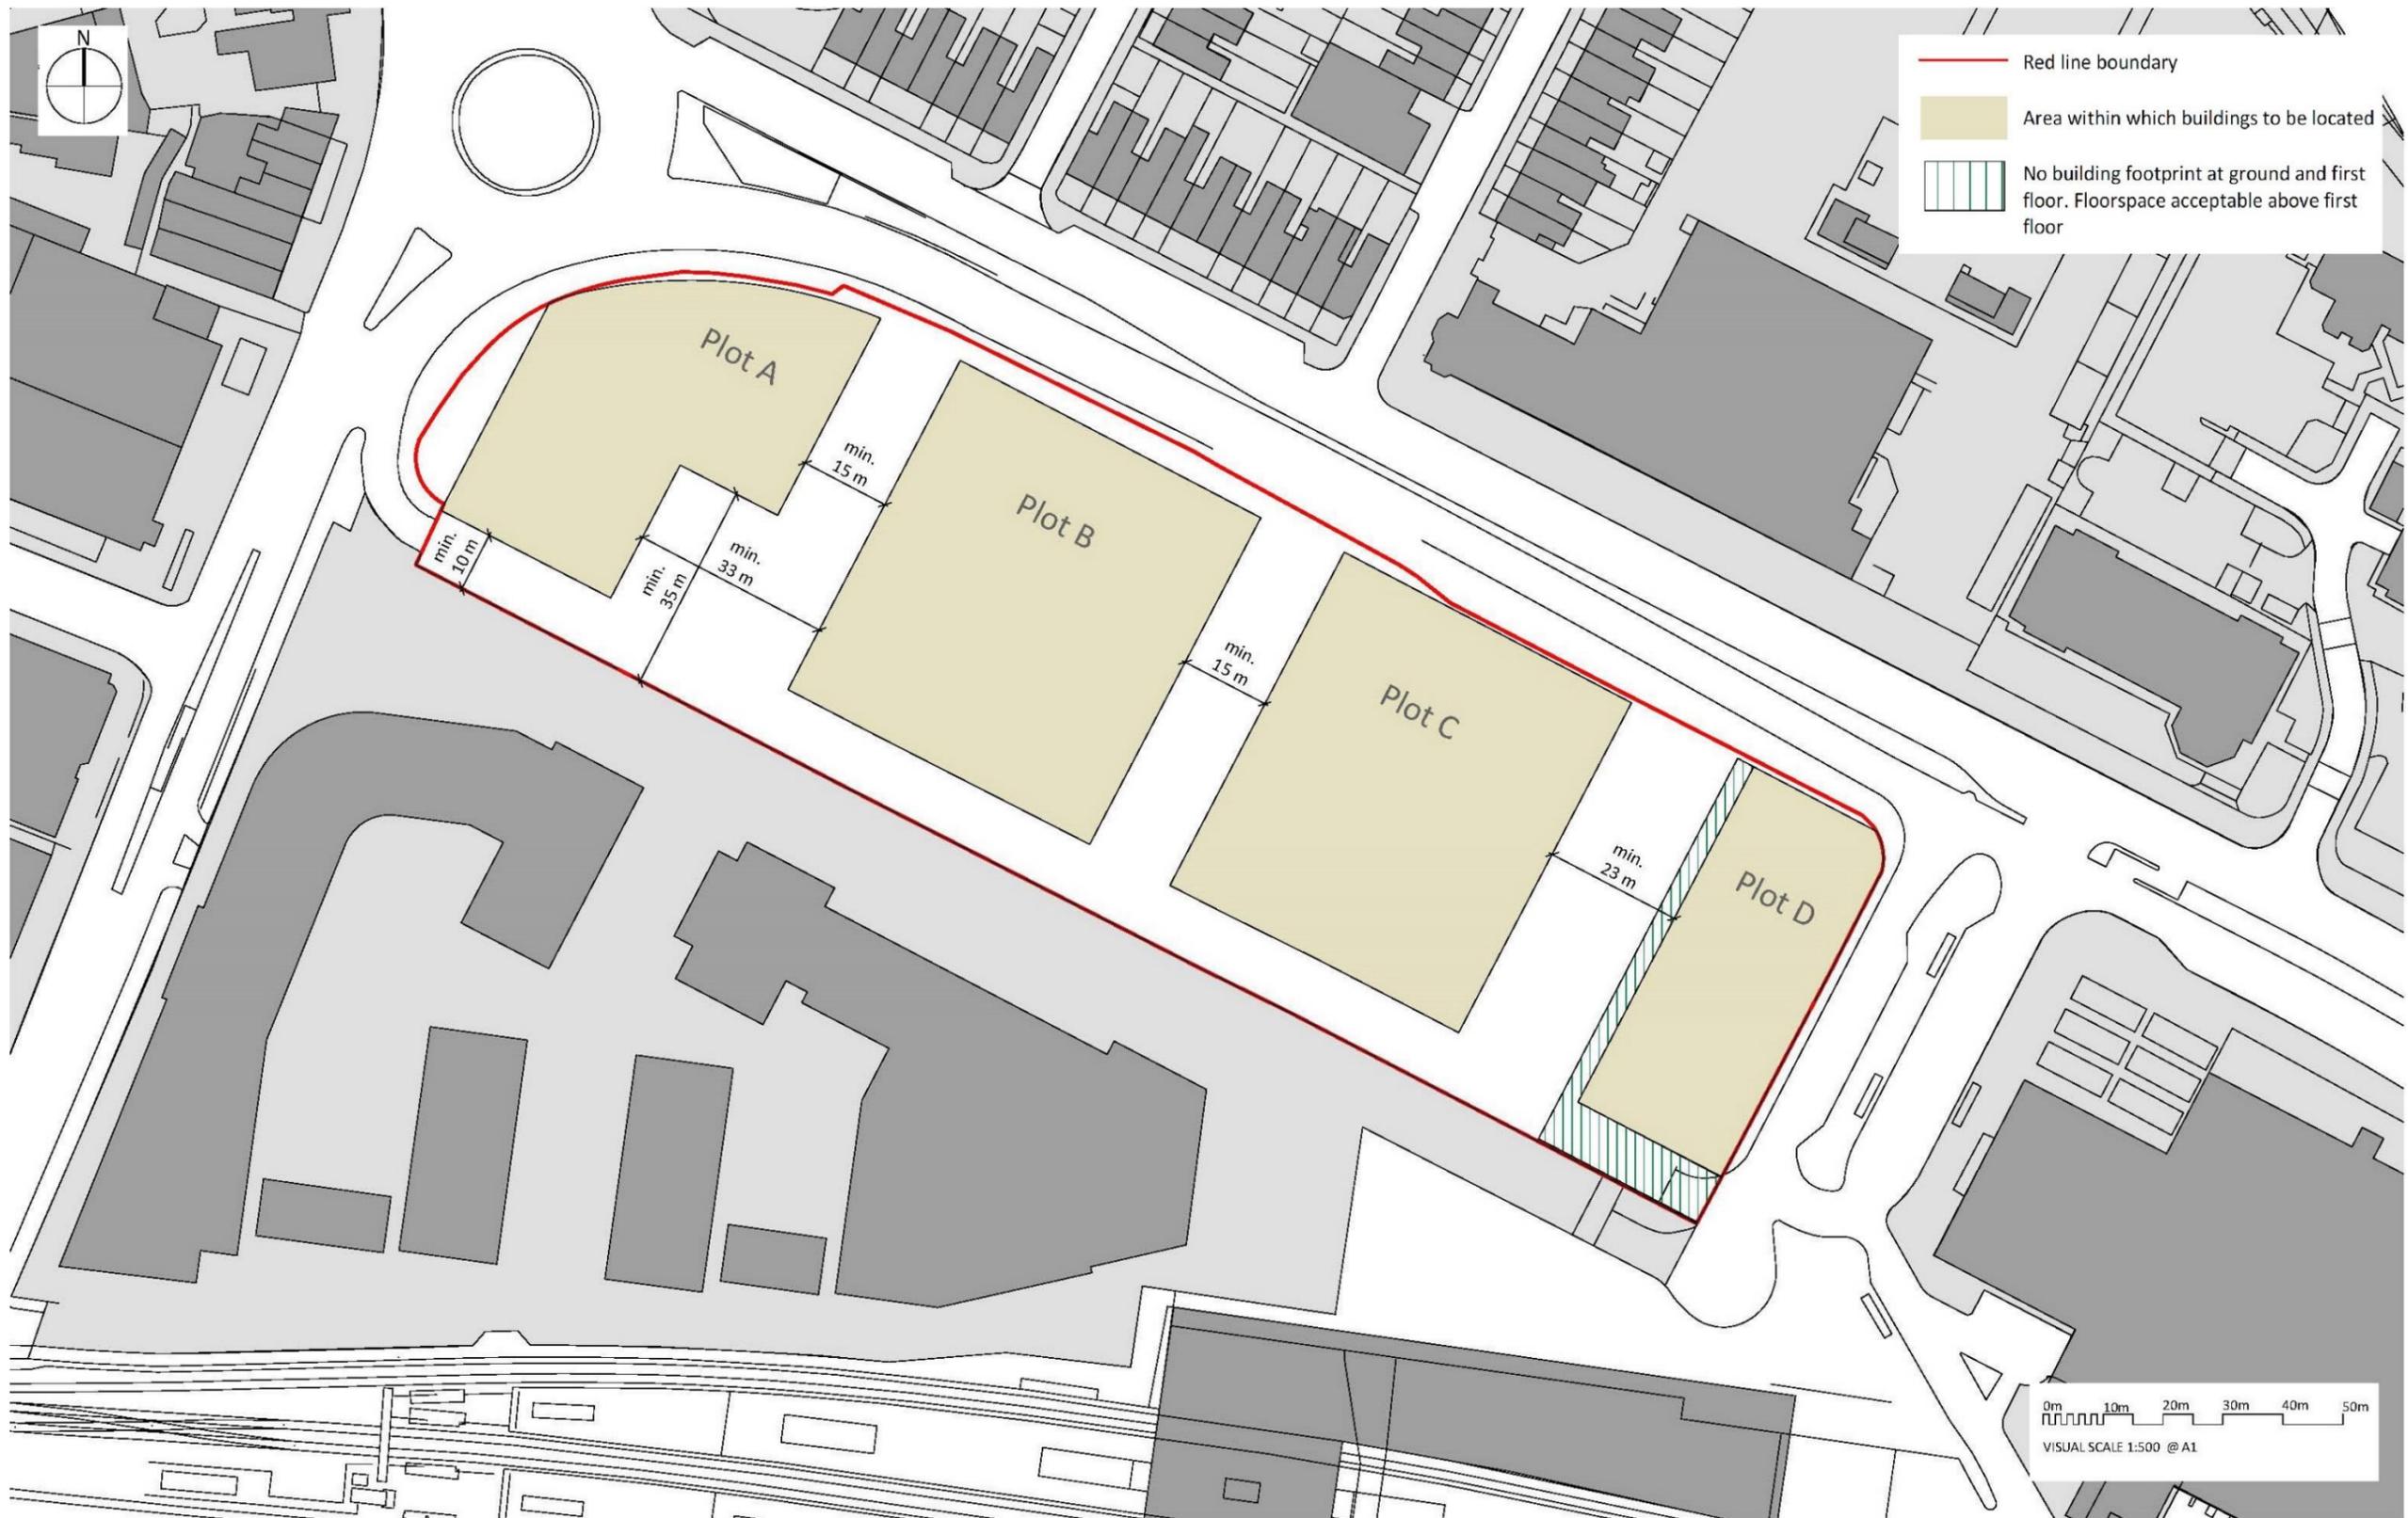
Parameter Plan 102 – Building Plot Allocation (Non-Residential)
